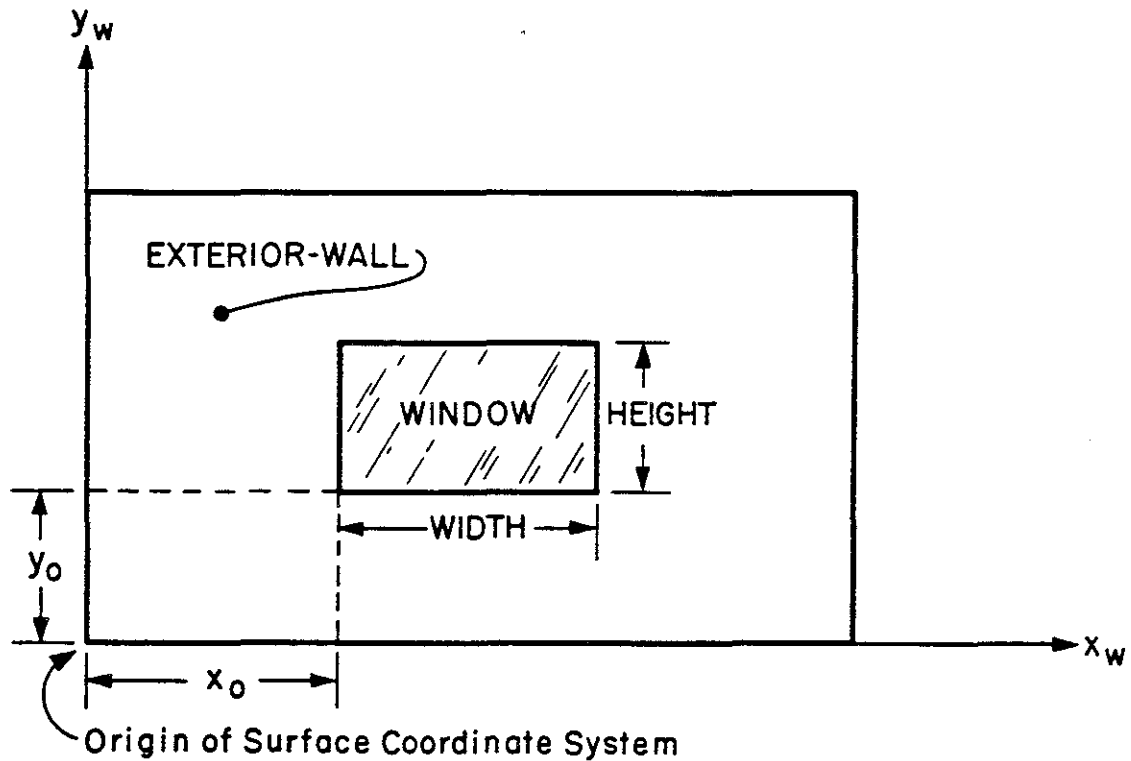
Locating WINDOWS and DOORS on an EXTERIOR-WALL.
